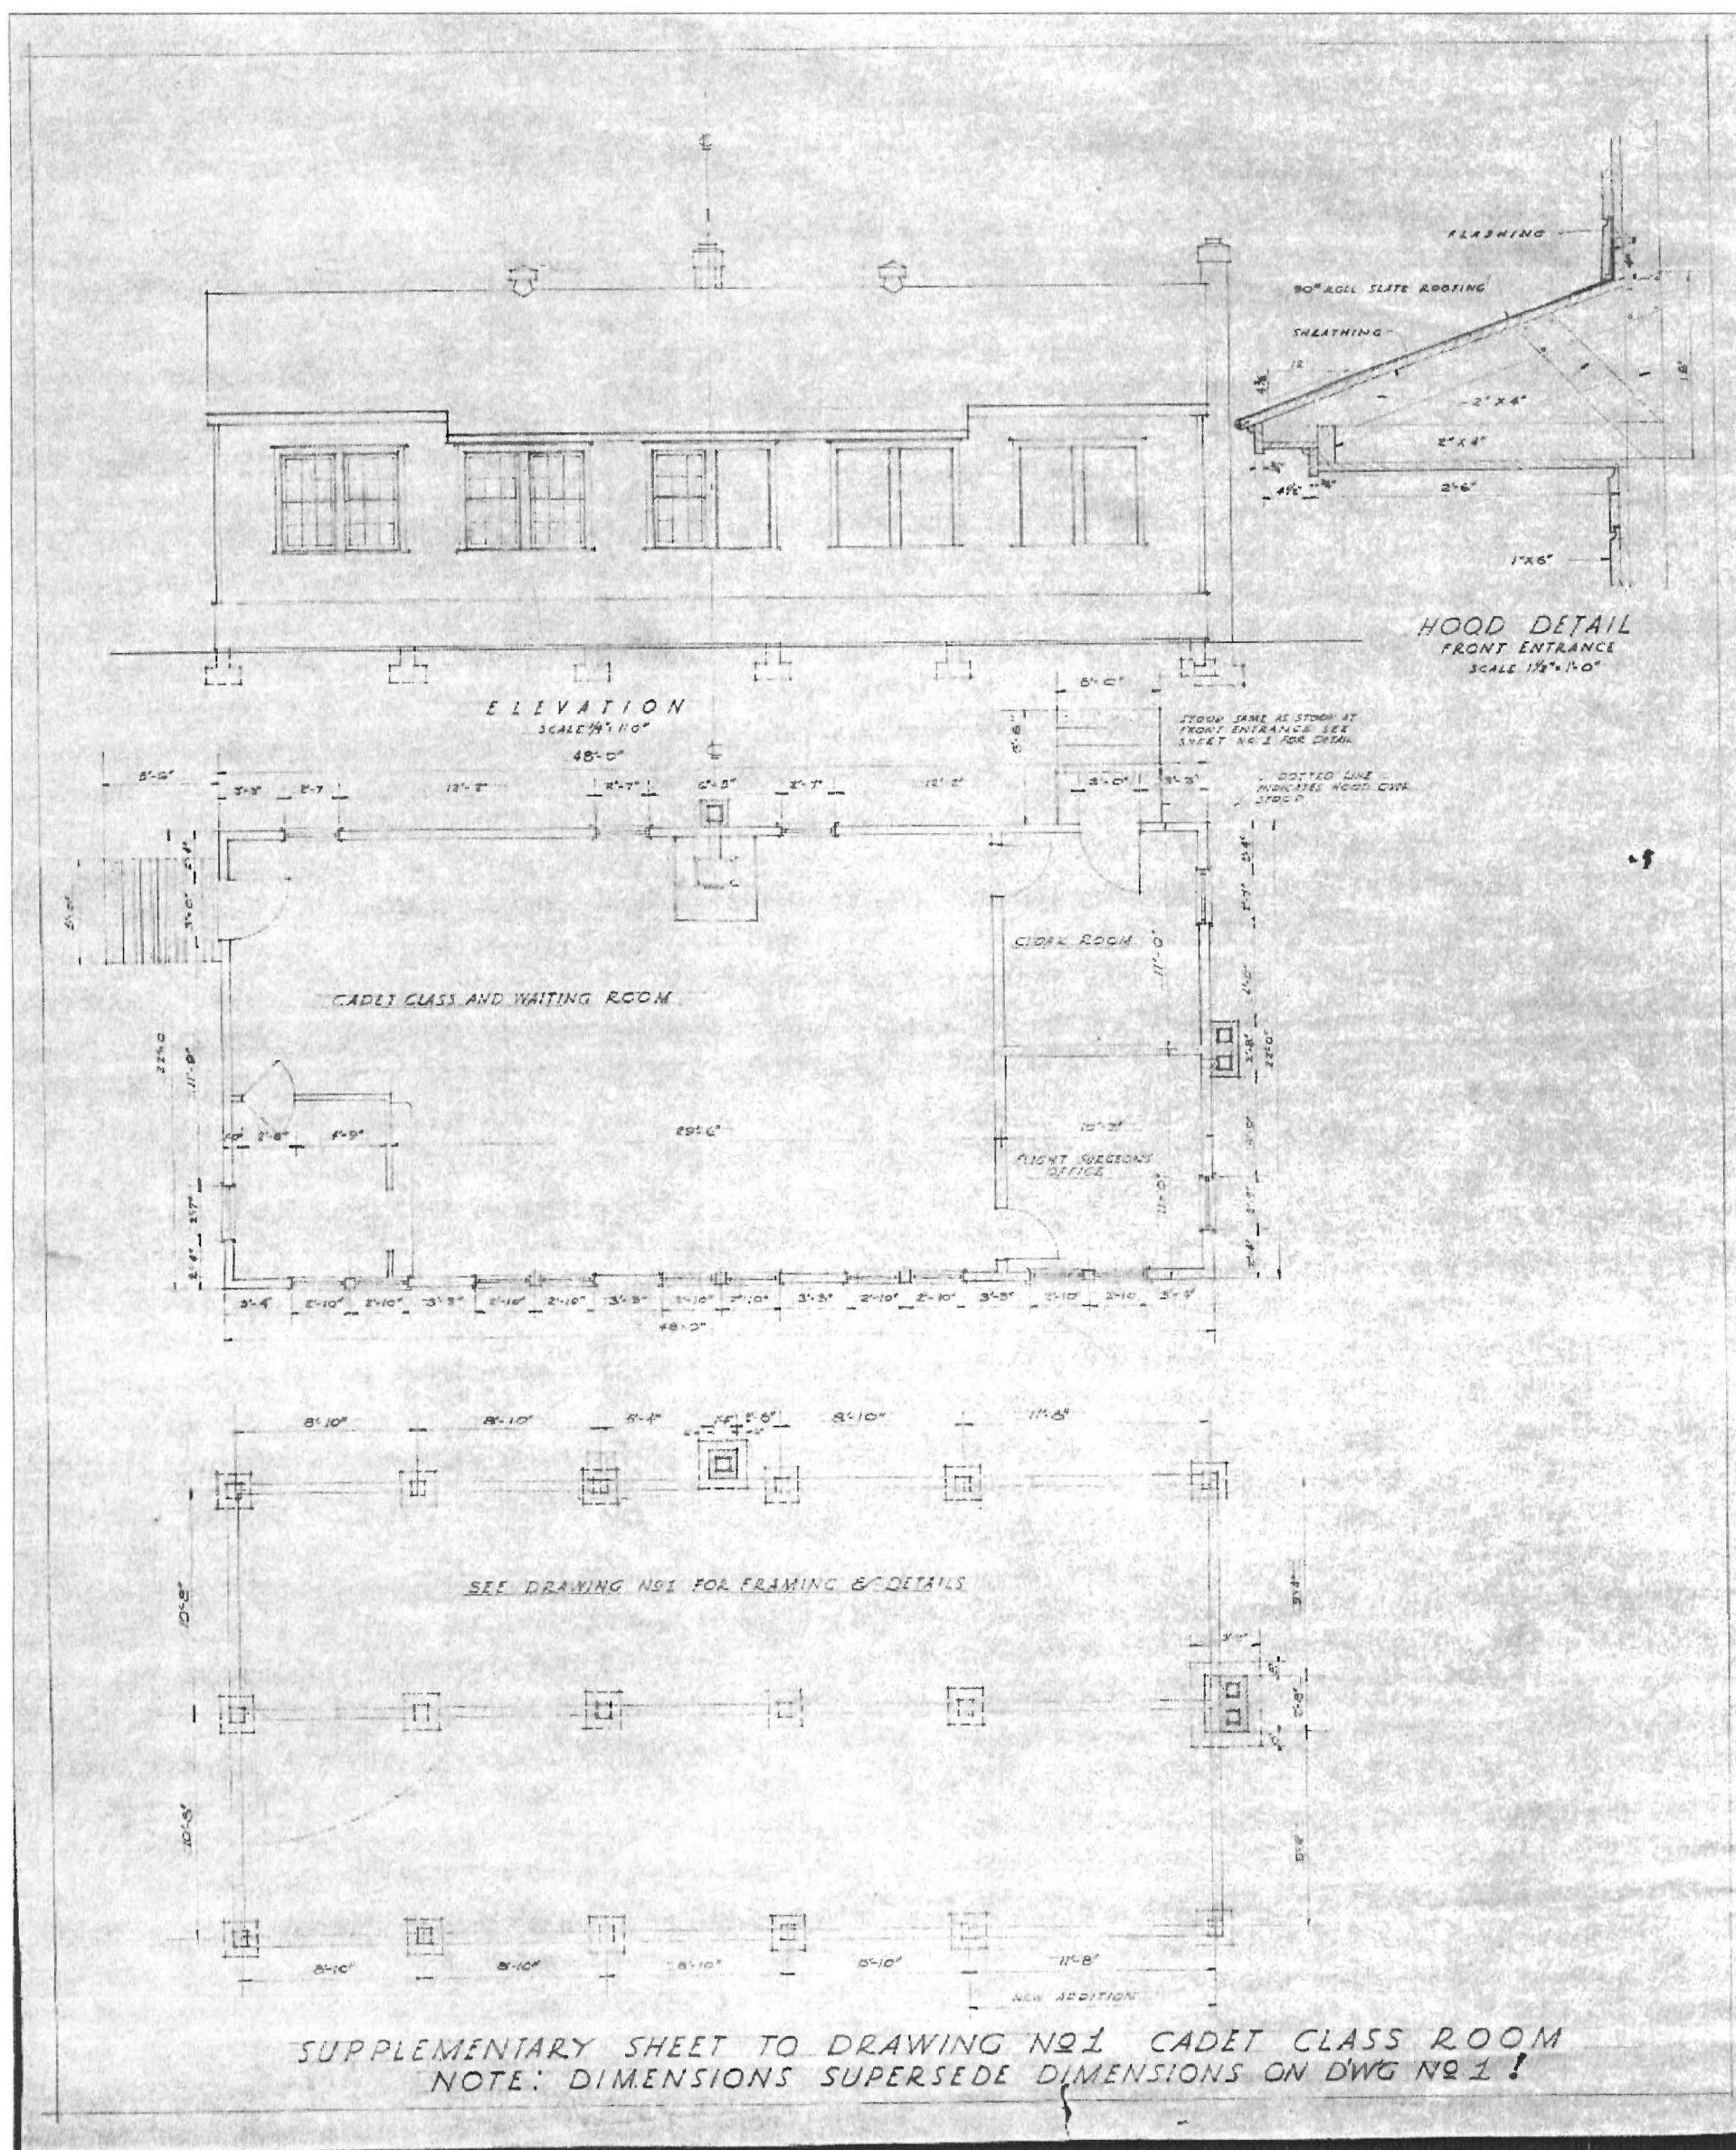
Supplementary drawing of the Cadet Class and Waiting Room from which the building was constructed, undated. Physical Plant, Tuskegee University.
